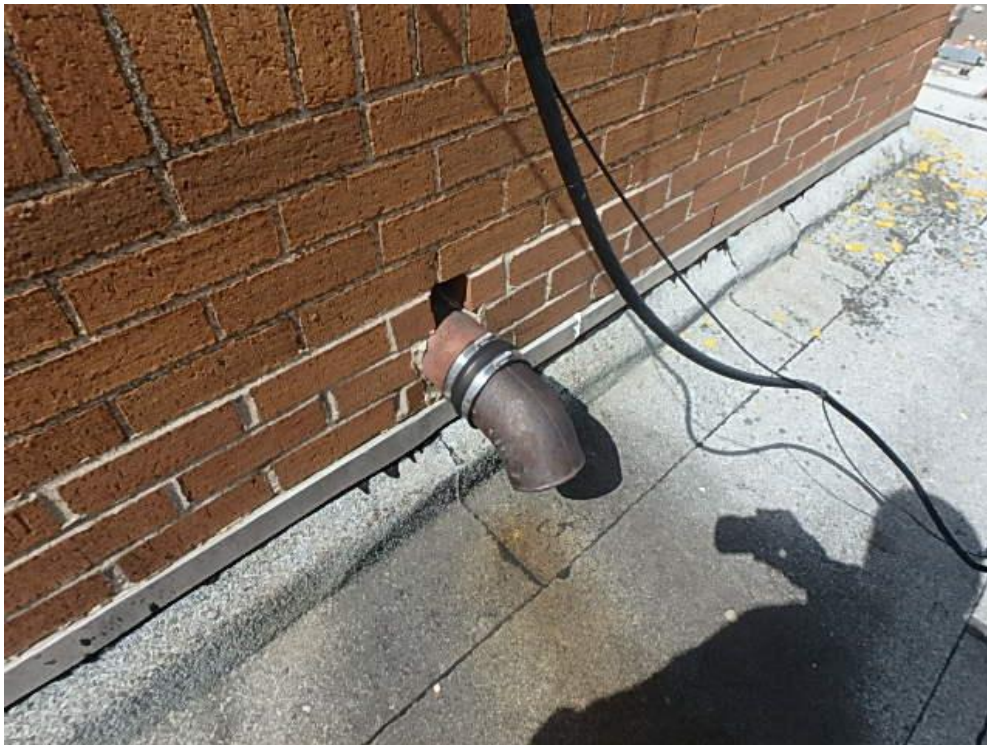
Roof Area 3.1 – unprotected conduit support and minor debris and membrane rust staining.
